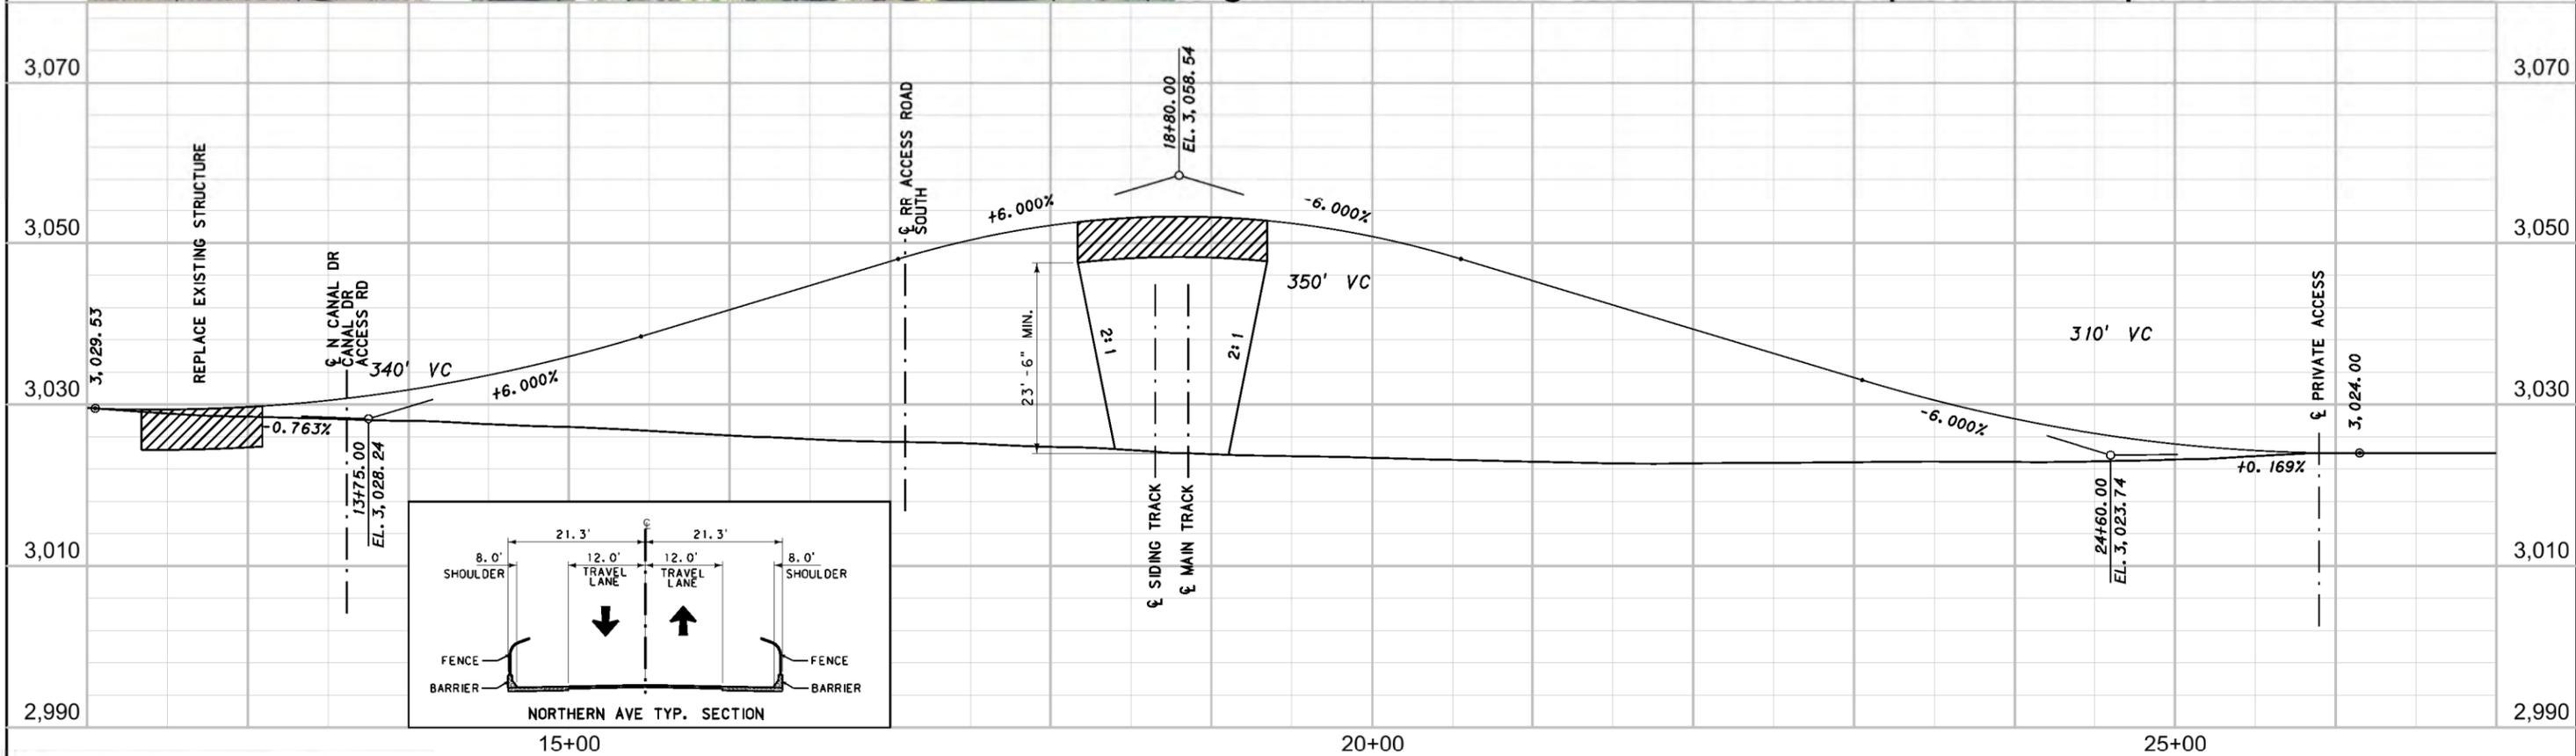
Northern Avenue Overpass Conceptual Plan and Profile
